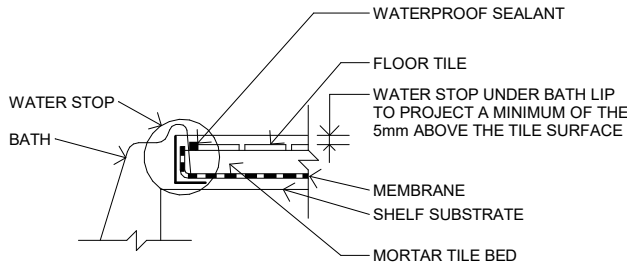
TYPICAL BATH JUNCTIONS
